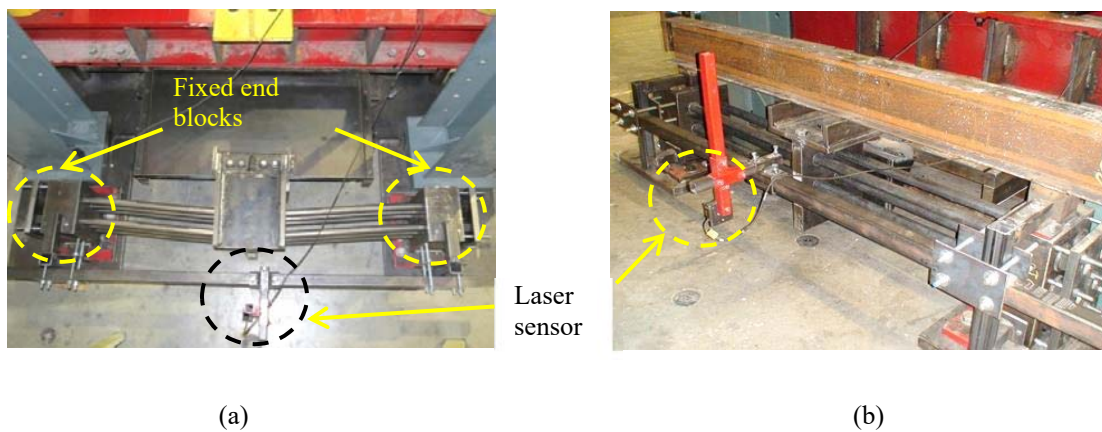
Plan view of the damper without girder (a); Fixing girder between blocks (b)
